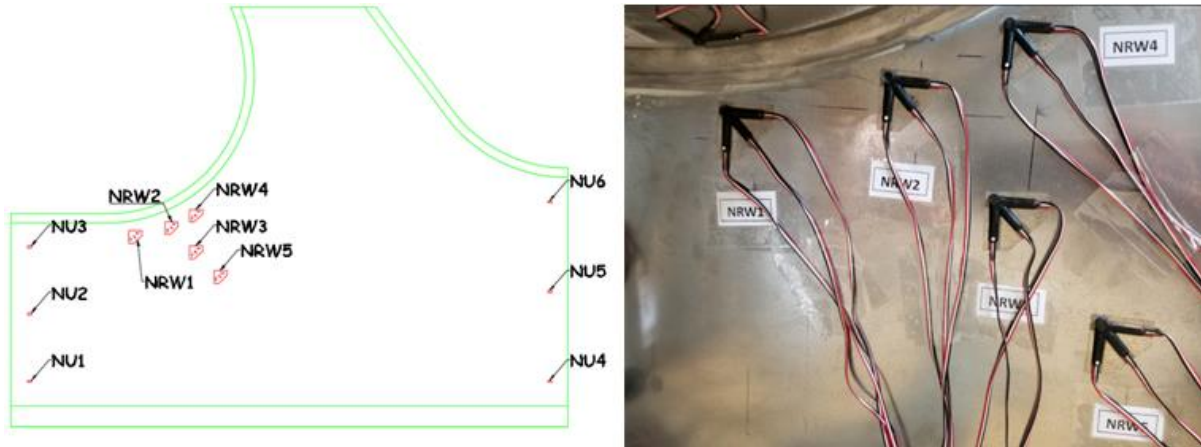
Instrumentation of North Side of the Scale Model of the Gusset-less Connection
